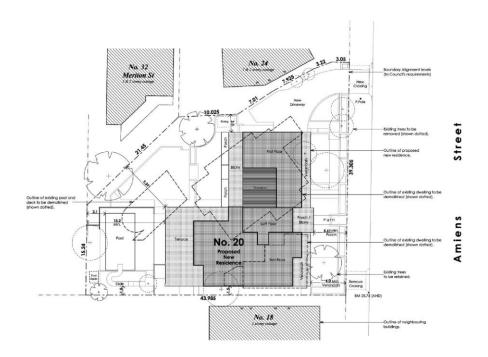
Proposed site plan with outline of existing structures shown dotted. (Source: DA Drawings, Alec Pappas Architects, May 2013)
